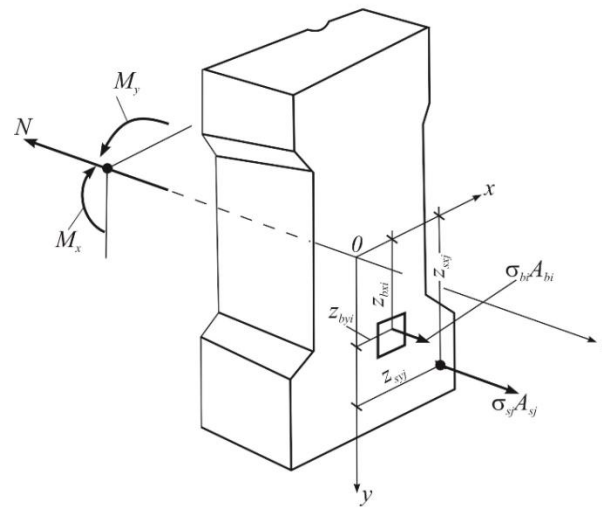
A calculation scheme of normal section of reinforced concrete element.
